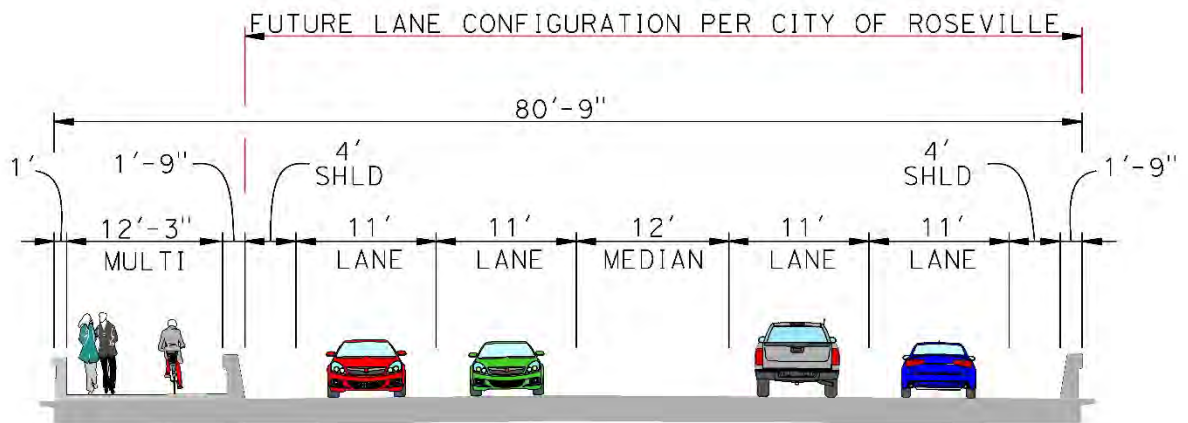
Atkinson Street Bridge over Dry Creek – Proposed Configuration
